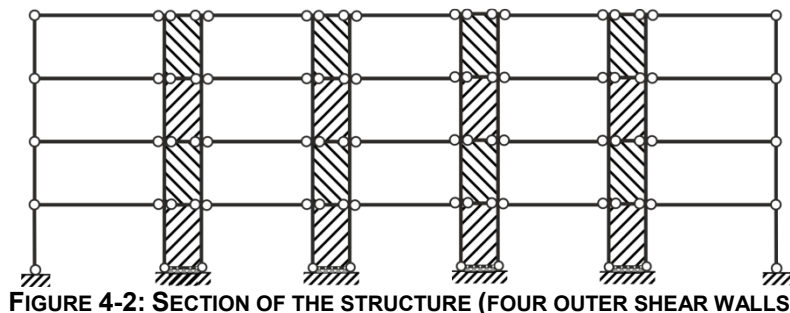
SECTION OF THE STRUCTURE (FOUR OUTER SHEAR WALLS)
